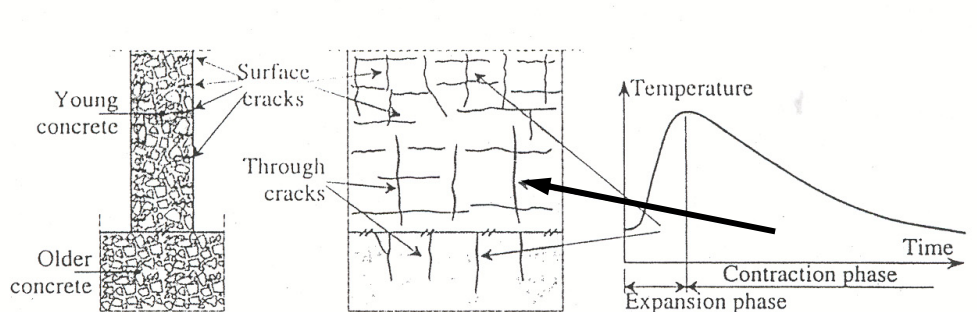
Example of cracking in a concrete wall due to internal and external restraint. [105]
